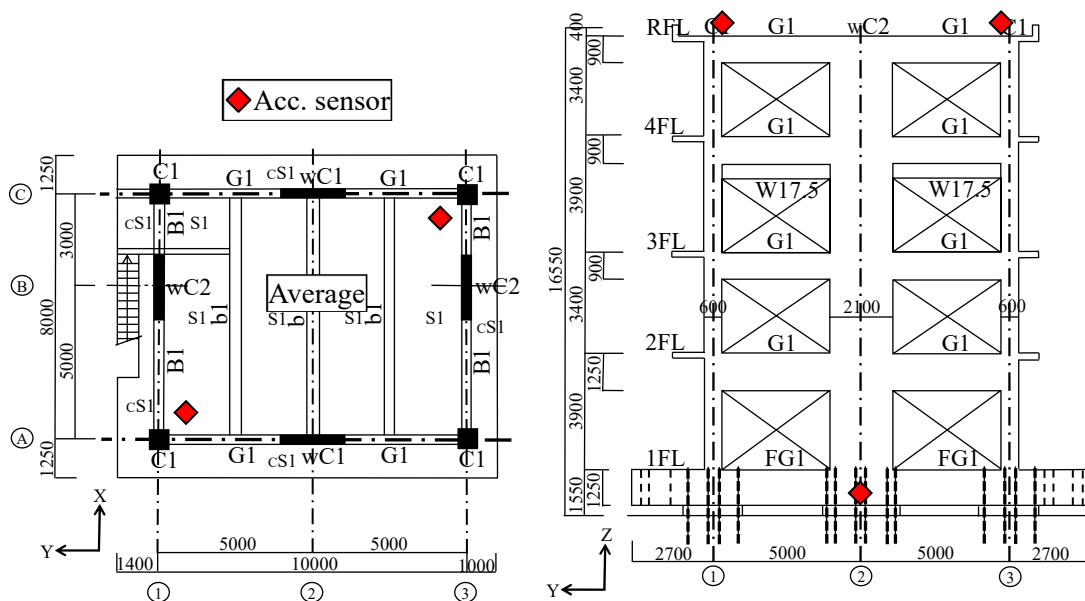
Configuration of specimen 1 (Left: plan view, Right: framing elevation) added some descriptions to the original figure in 5-10, 5-11
